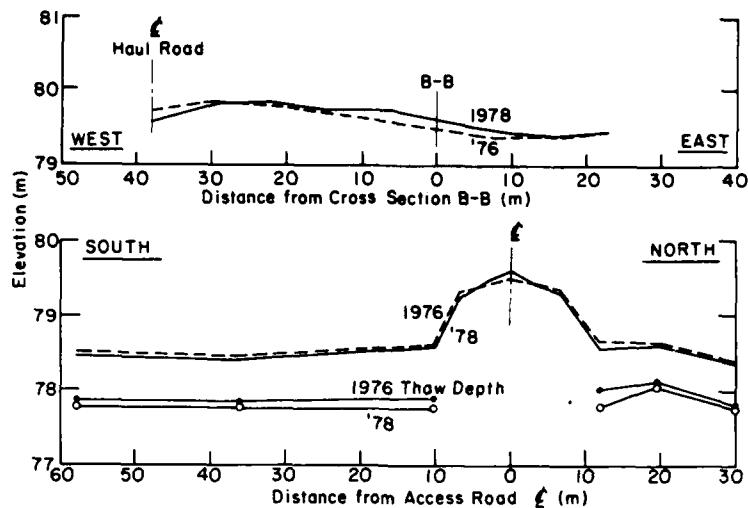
Surface elevations, Access Road 133-APL-1. The upper graph shows the elevations on the centerline profile (A-A); the lower graph shows the elevations on cross section B-B.
